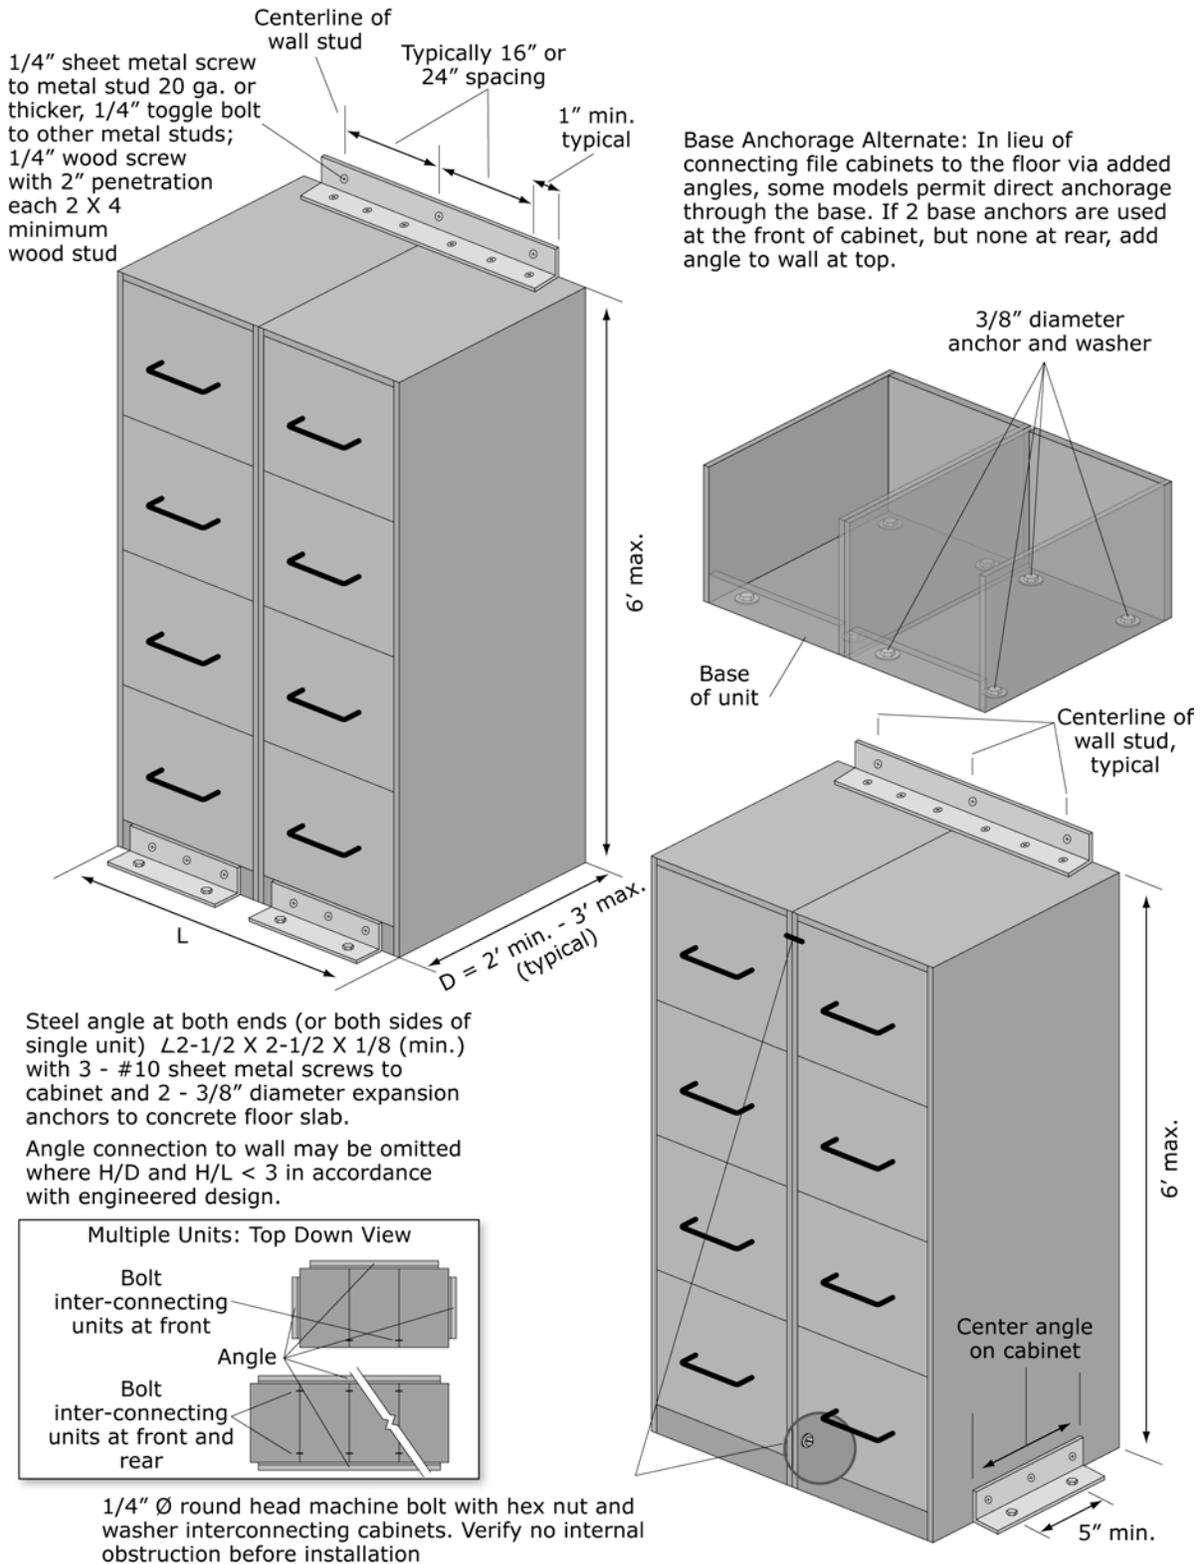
Wall-mounted file cabinets (NE).
